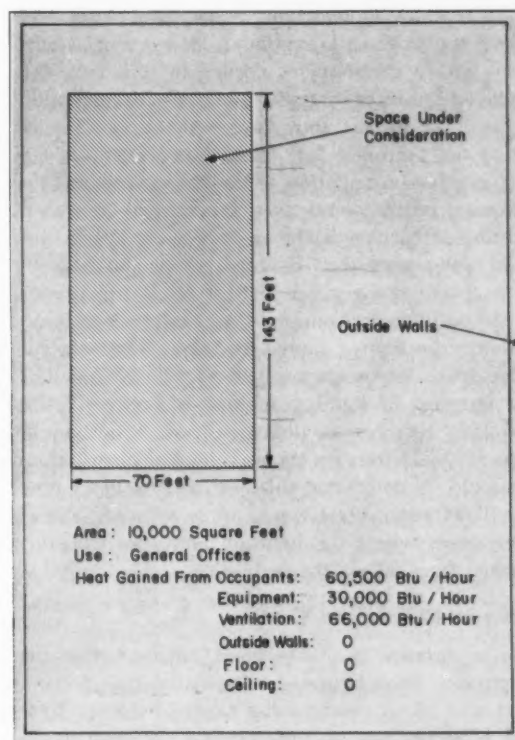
Air conditioned interior office space selected as example has no heat gain through walls, floor, or ceiling since surrounding spaces are also air conditioned. All lighting fixtures are fluorescent type.
